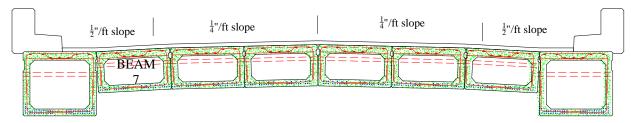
Beam 7 Location in Section of Lakeview Drive
